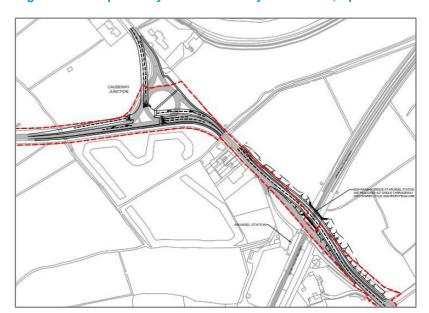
Proposed layout for Causeway roundabout, Option 0A
